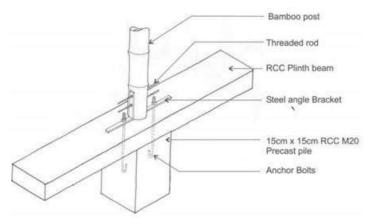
59Fixing detail of bamboo to plinth using anchor bolts
